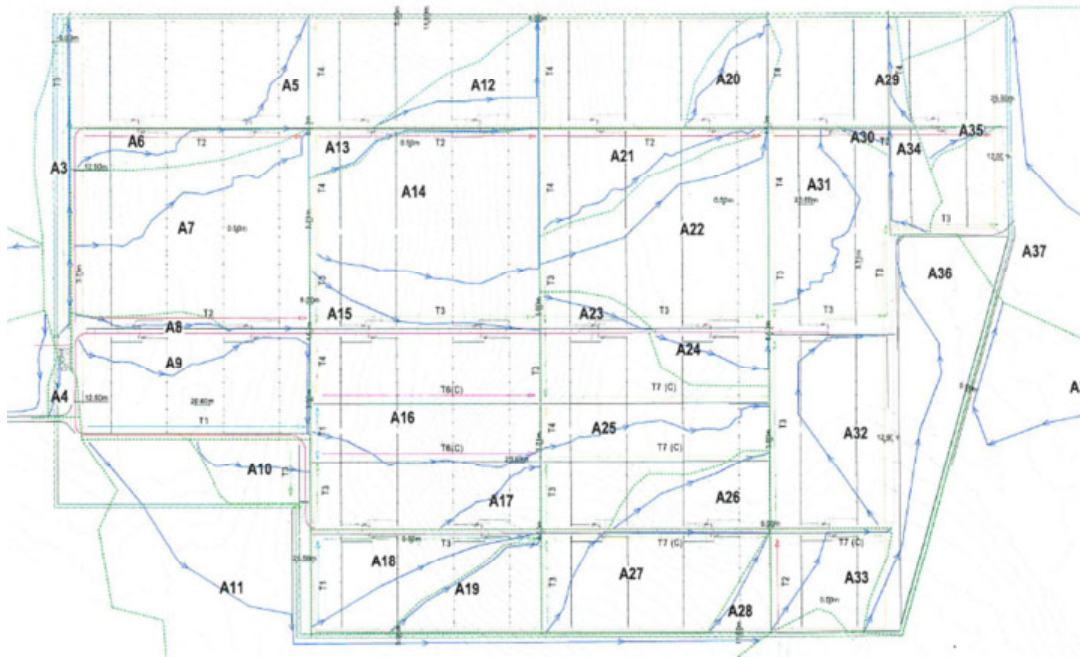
Contour Plan of PV Area and Drainage Pattern.
